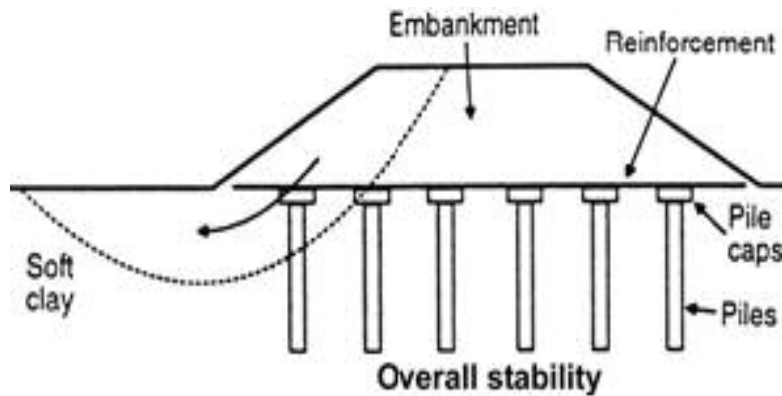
Ultimate Limit State for Pile-Supported Embankment (Floss and Brau, 2003)
